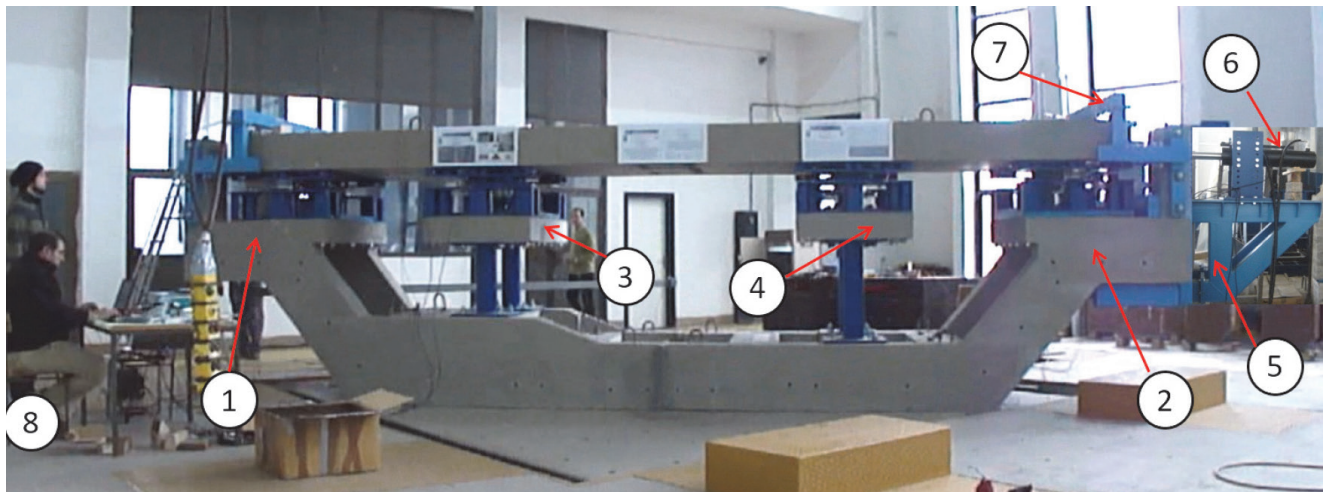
ISUBRIDGE model on the IZIIS shaking table (re-used prototype): 1. Left end support; 2. Right end support; 3. Support above shorter piers; 4. Support above longer piers; 5. Actuator supporting structure; 6. Actuator; 7. support of DL devices; and 8. Computer controlling the cyclic tests
